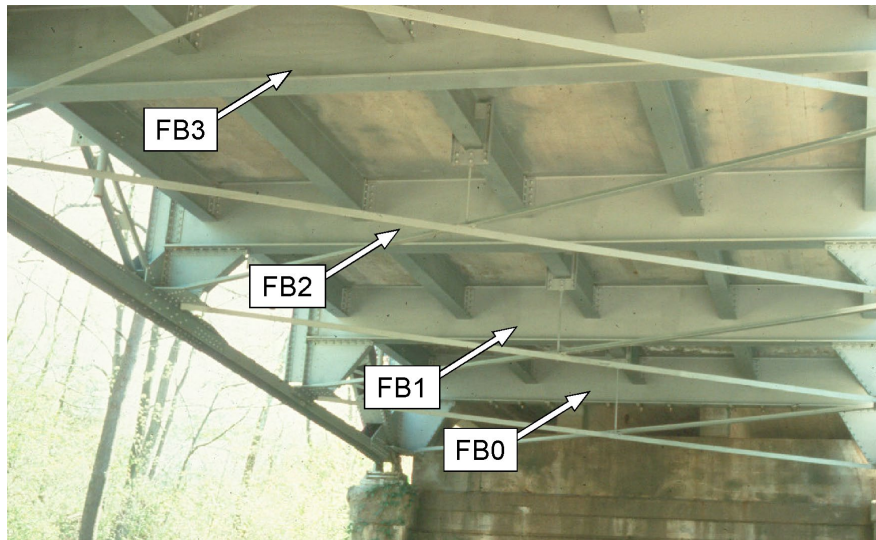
Floor System with Stringers Connected to Floorbeam Webs
